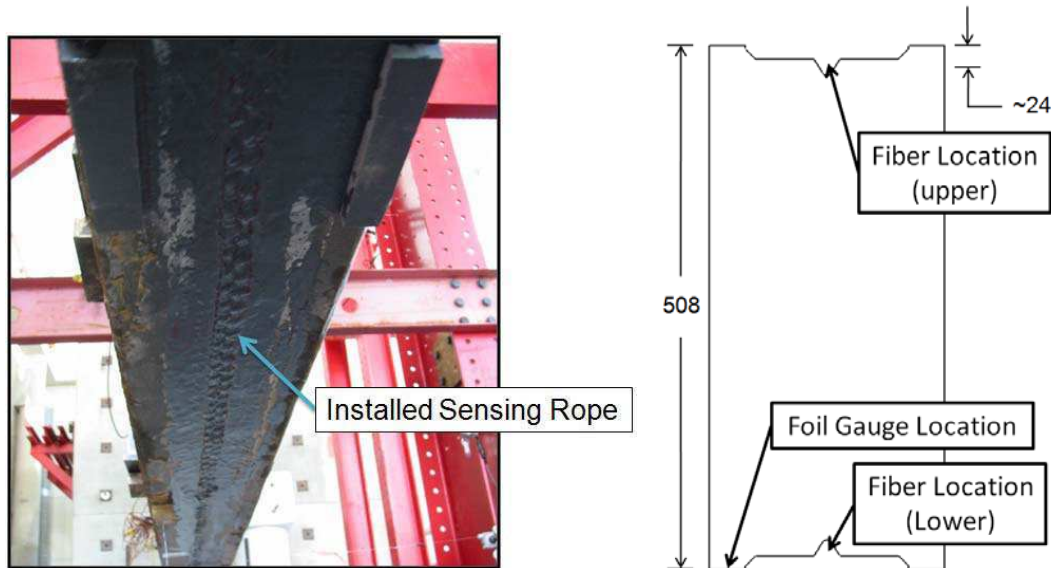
(a) Sensing rope installed the full length of the composite beam (b) Schematic of beam construction
